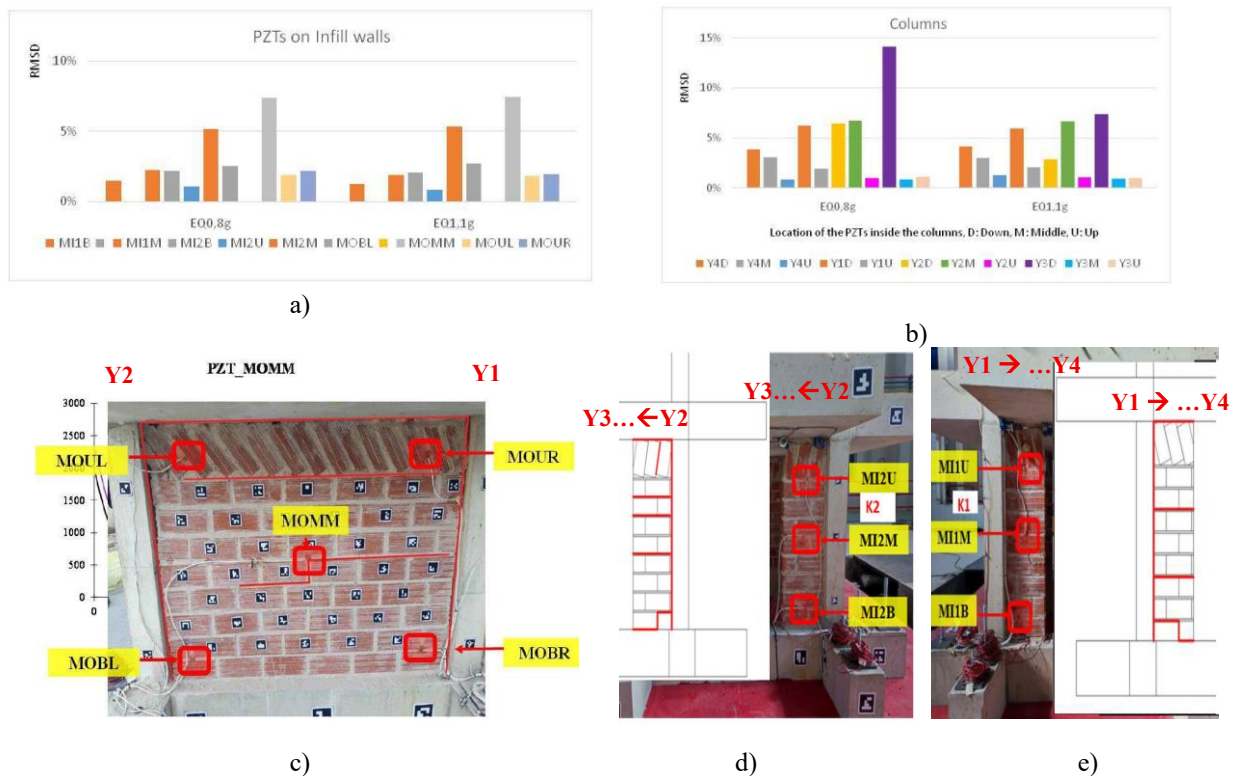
Damage details for a) PZTs on infill walls, b) PZTs on columns and visual damage observation on infill between c) columns 1-2, d) columns 2-3 and e) columns 1-4
